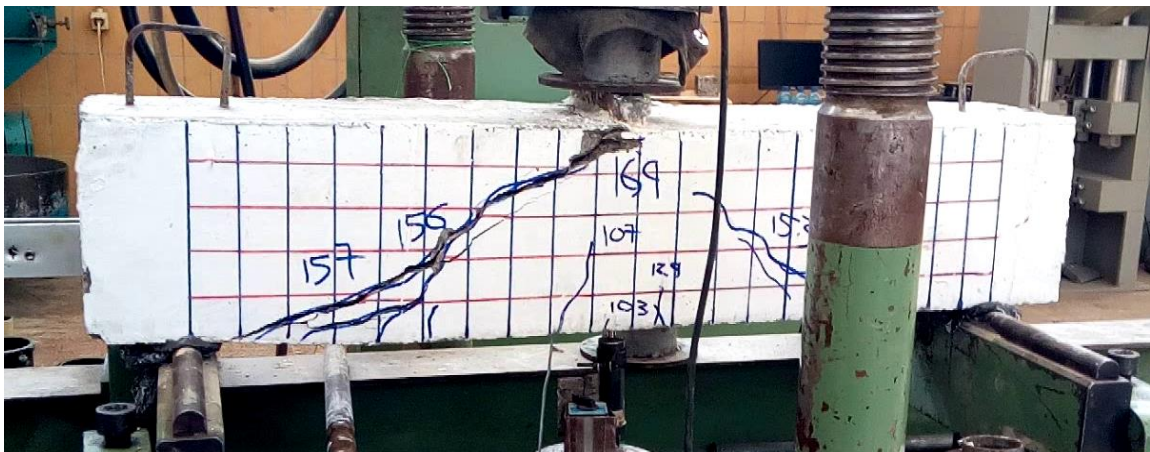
Specimen BS24 beam with shear reinforcement after failure
